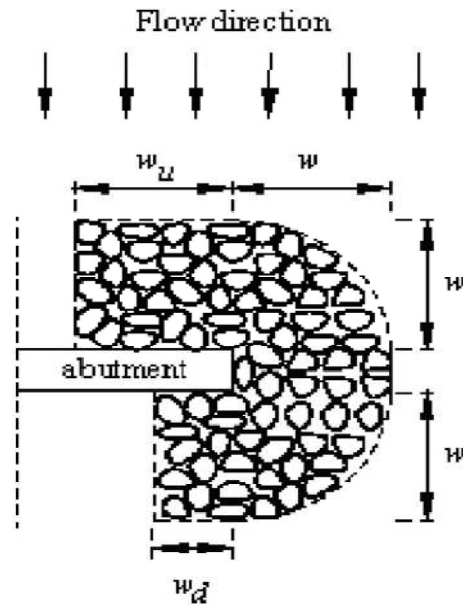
Layout of Riprap mattress for vertical wall abutments
